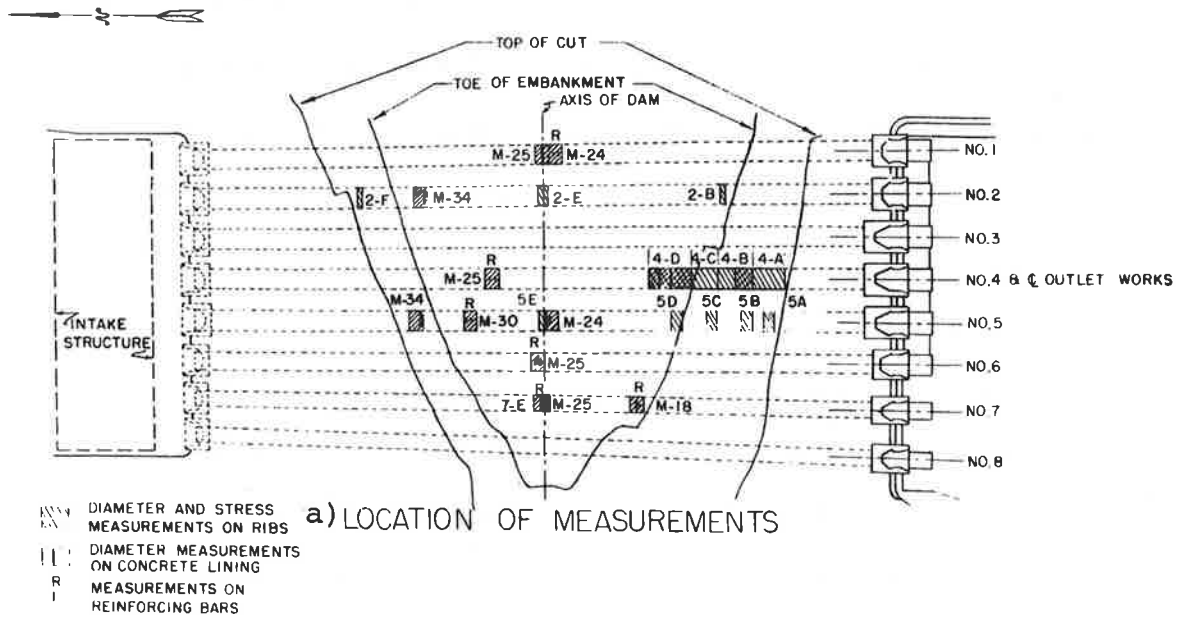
LOCATION OF INSTRUMENTED SECTIONS--GARRISON DAM TUNNELS (FROM BURKE, 1960)
